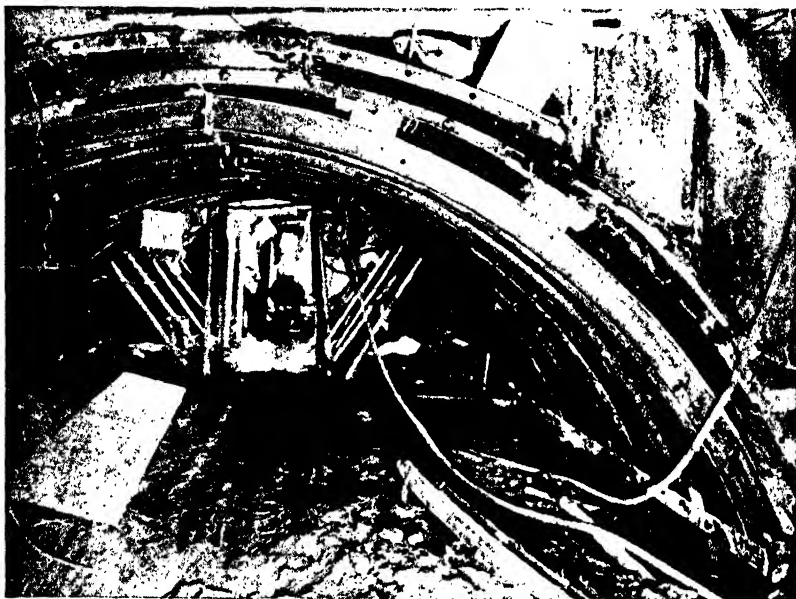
Top heading driven with liner plate and rib support. Liner plates are carried on trench jacks off the bench until ribs can be set up and the load picked up by wedging. When the bench is excavated, the steel wall plate must be underpinned until the lower half of the rib is placed. (Courtesy of Commercial Shearing & Stamping Co.)
